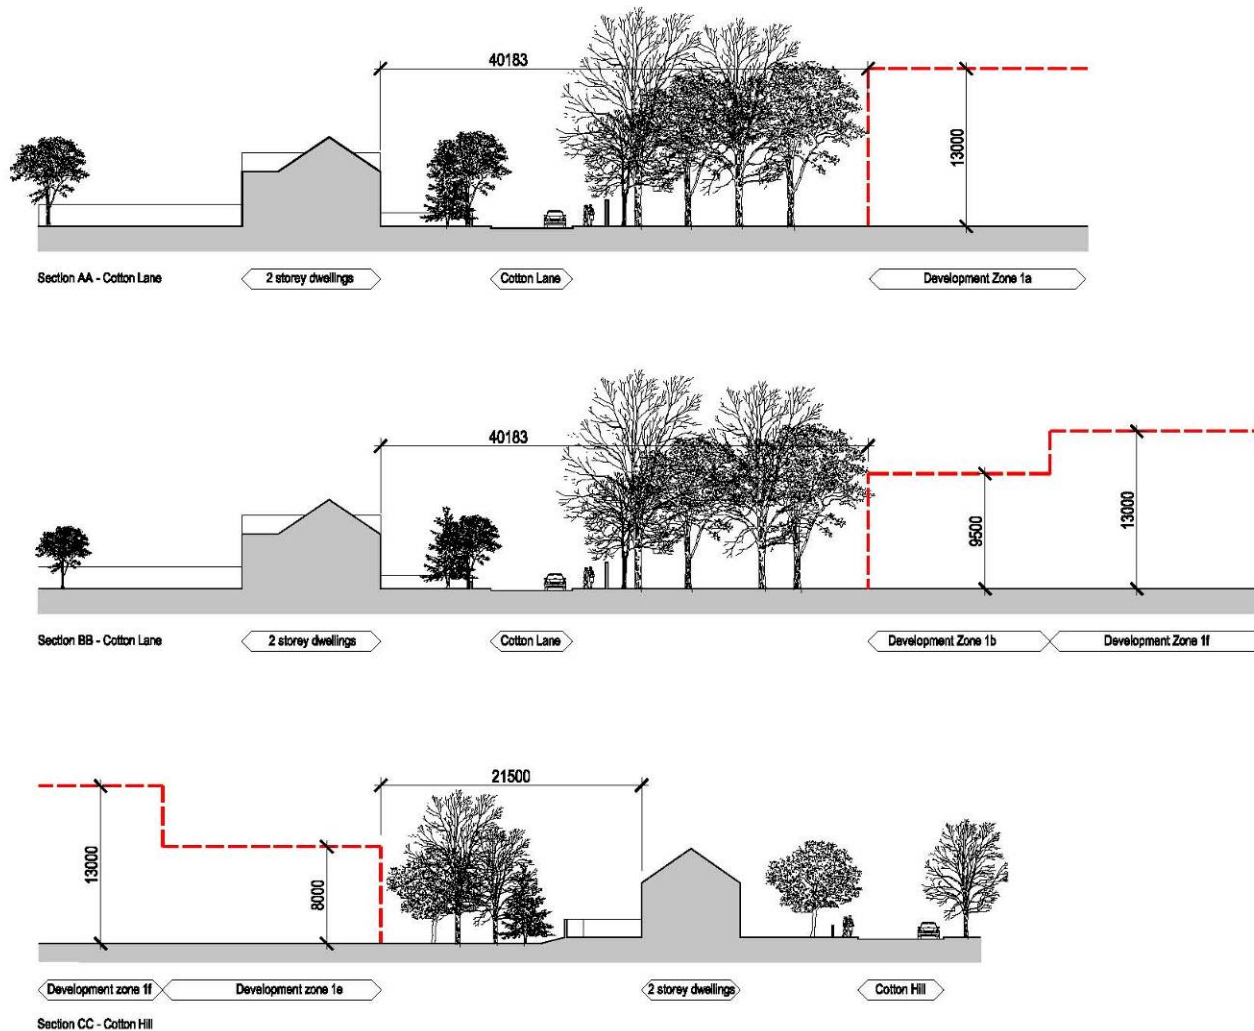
Potential Site Sections 1 (note – dimensions are approximate)
